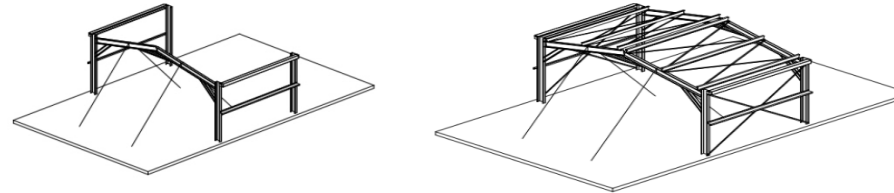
Frame First Temporary Bracing on First Rafter Installed Fig 2. Temporary Bracing Installed as X Bracing
